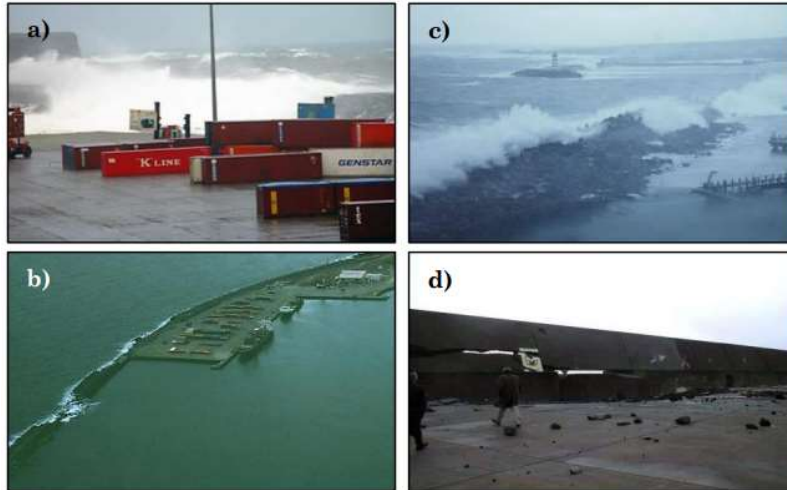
Damage to the south and north breakwater after the storm event on 21st December 2001 (*Source: Poseiro (2019)*)
